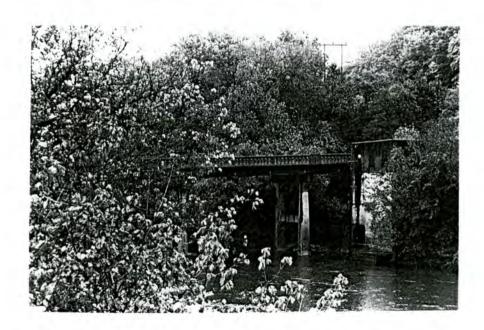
Bridge No. 75 and Pump House (No. 8), Looking Northeast across the Smith River.
